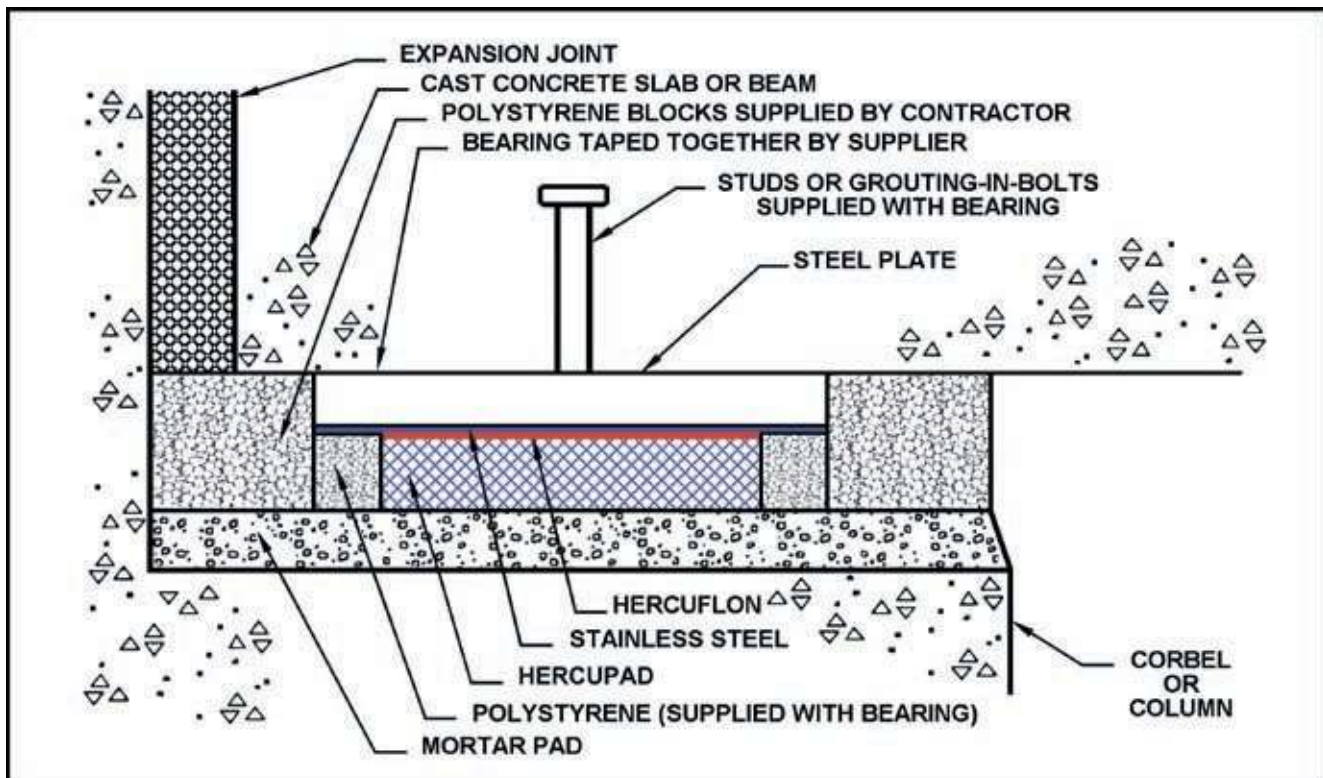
Installation of HLD/FF Bearing in a Concrete Structure
